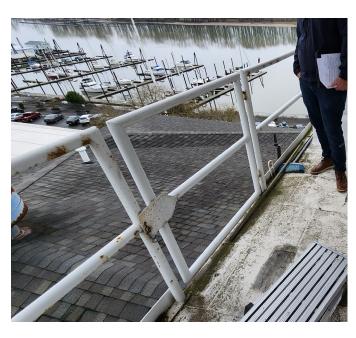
PHOTOS OF THE DETERIORATED BELL TOWER COLUMNS & RAILING
